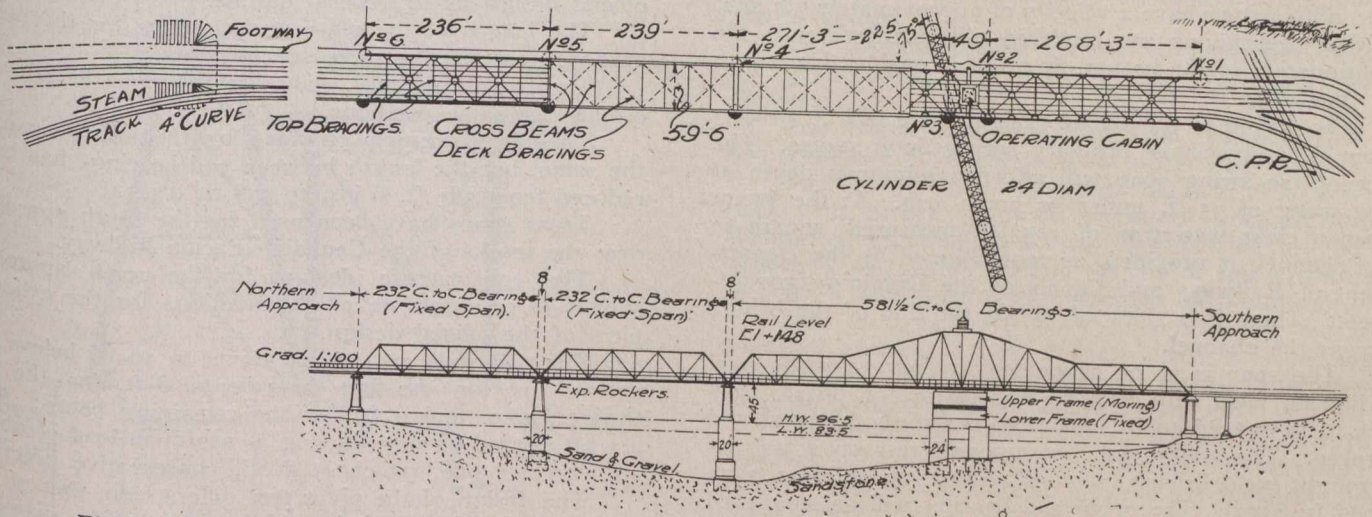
Sketch of Plans for the Second Narrows Bridge, Prepared by Sir John Wolfe-Barry, Lyster & Company, England.
